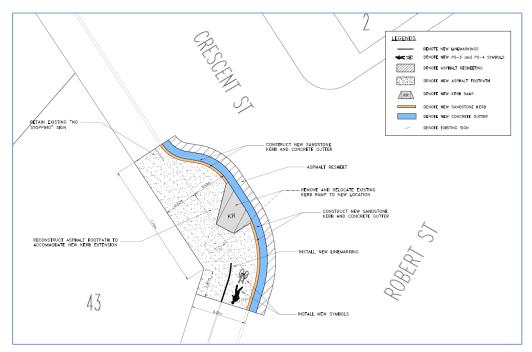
Proposed kerb extensions at Crescent Street / Robert Street.
